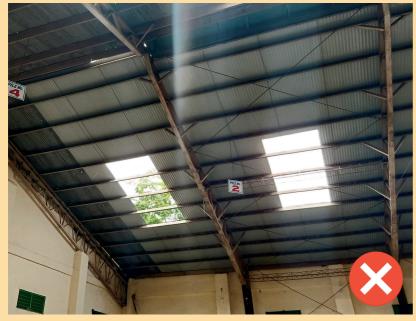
Damaged warehouse roof (Source: Gomez, 2021)
